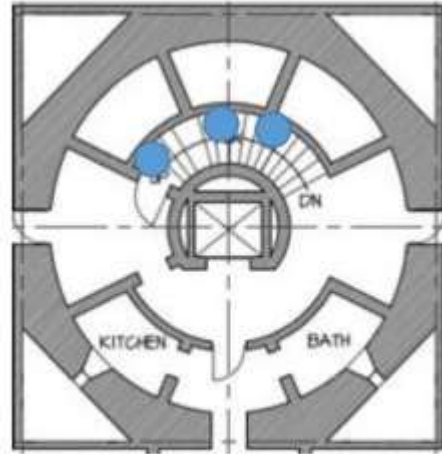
Blue dots shows efflorescence and other damages observed on the Powell Street mural located on the stairs from the first to the second floor.
